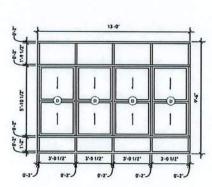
STOREFRONT SYSTEM BETTHERS
